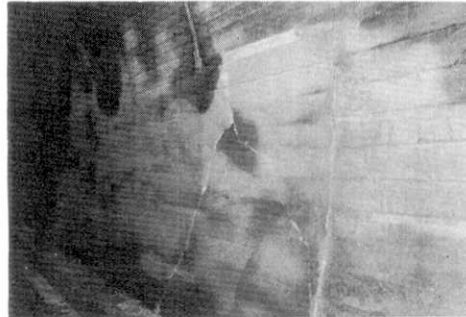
Cracks in the concrete lining at Nakagi tunnel.
